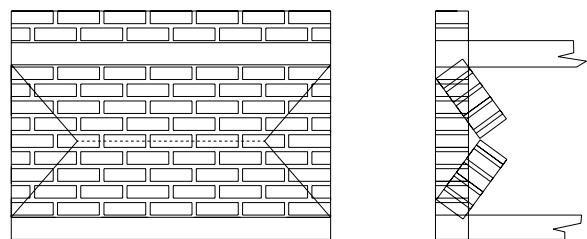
Out-of-plane failure of the non-reinforced masonry structure
